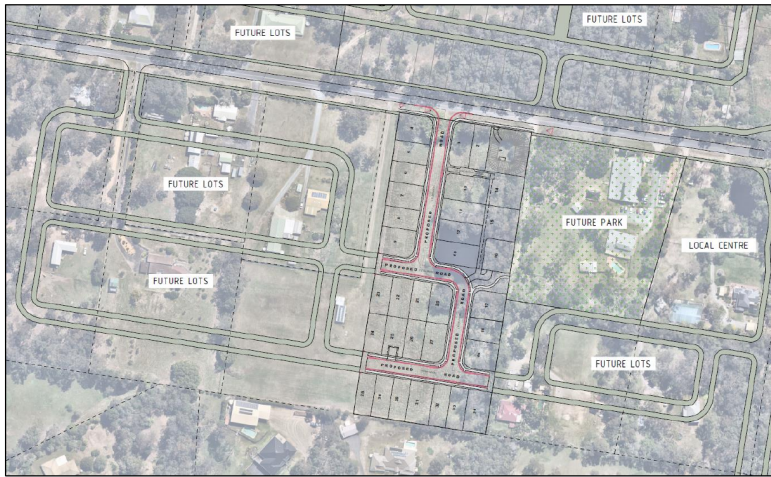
Extract of Accompanying Structure Plan (Archline Design Studio)
